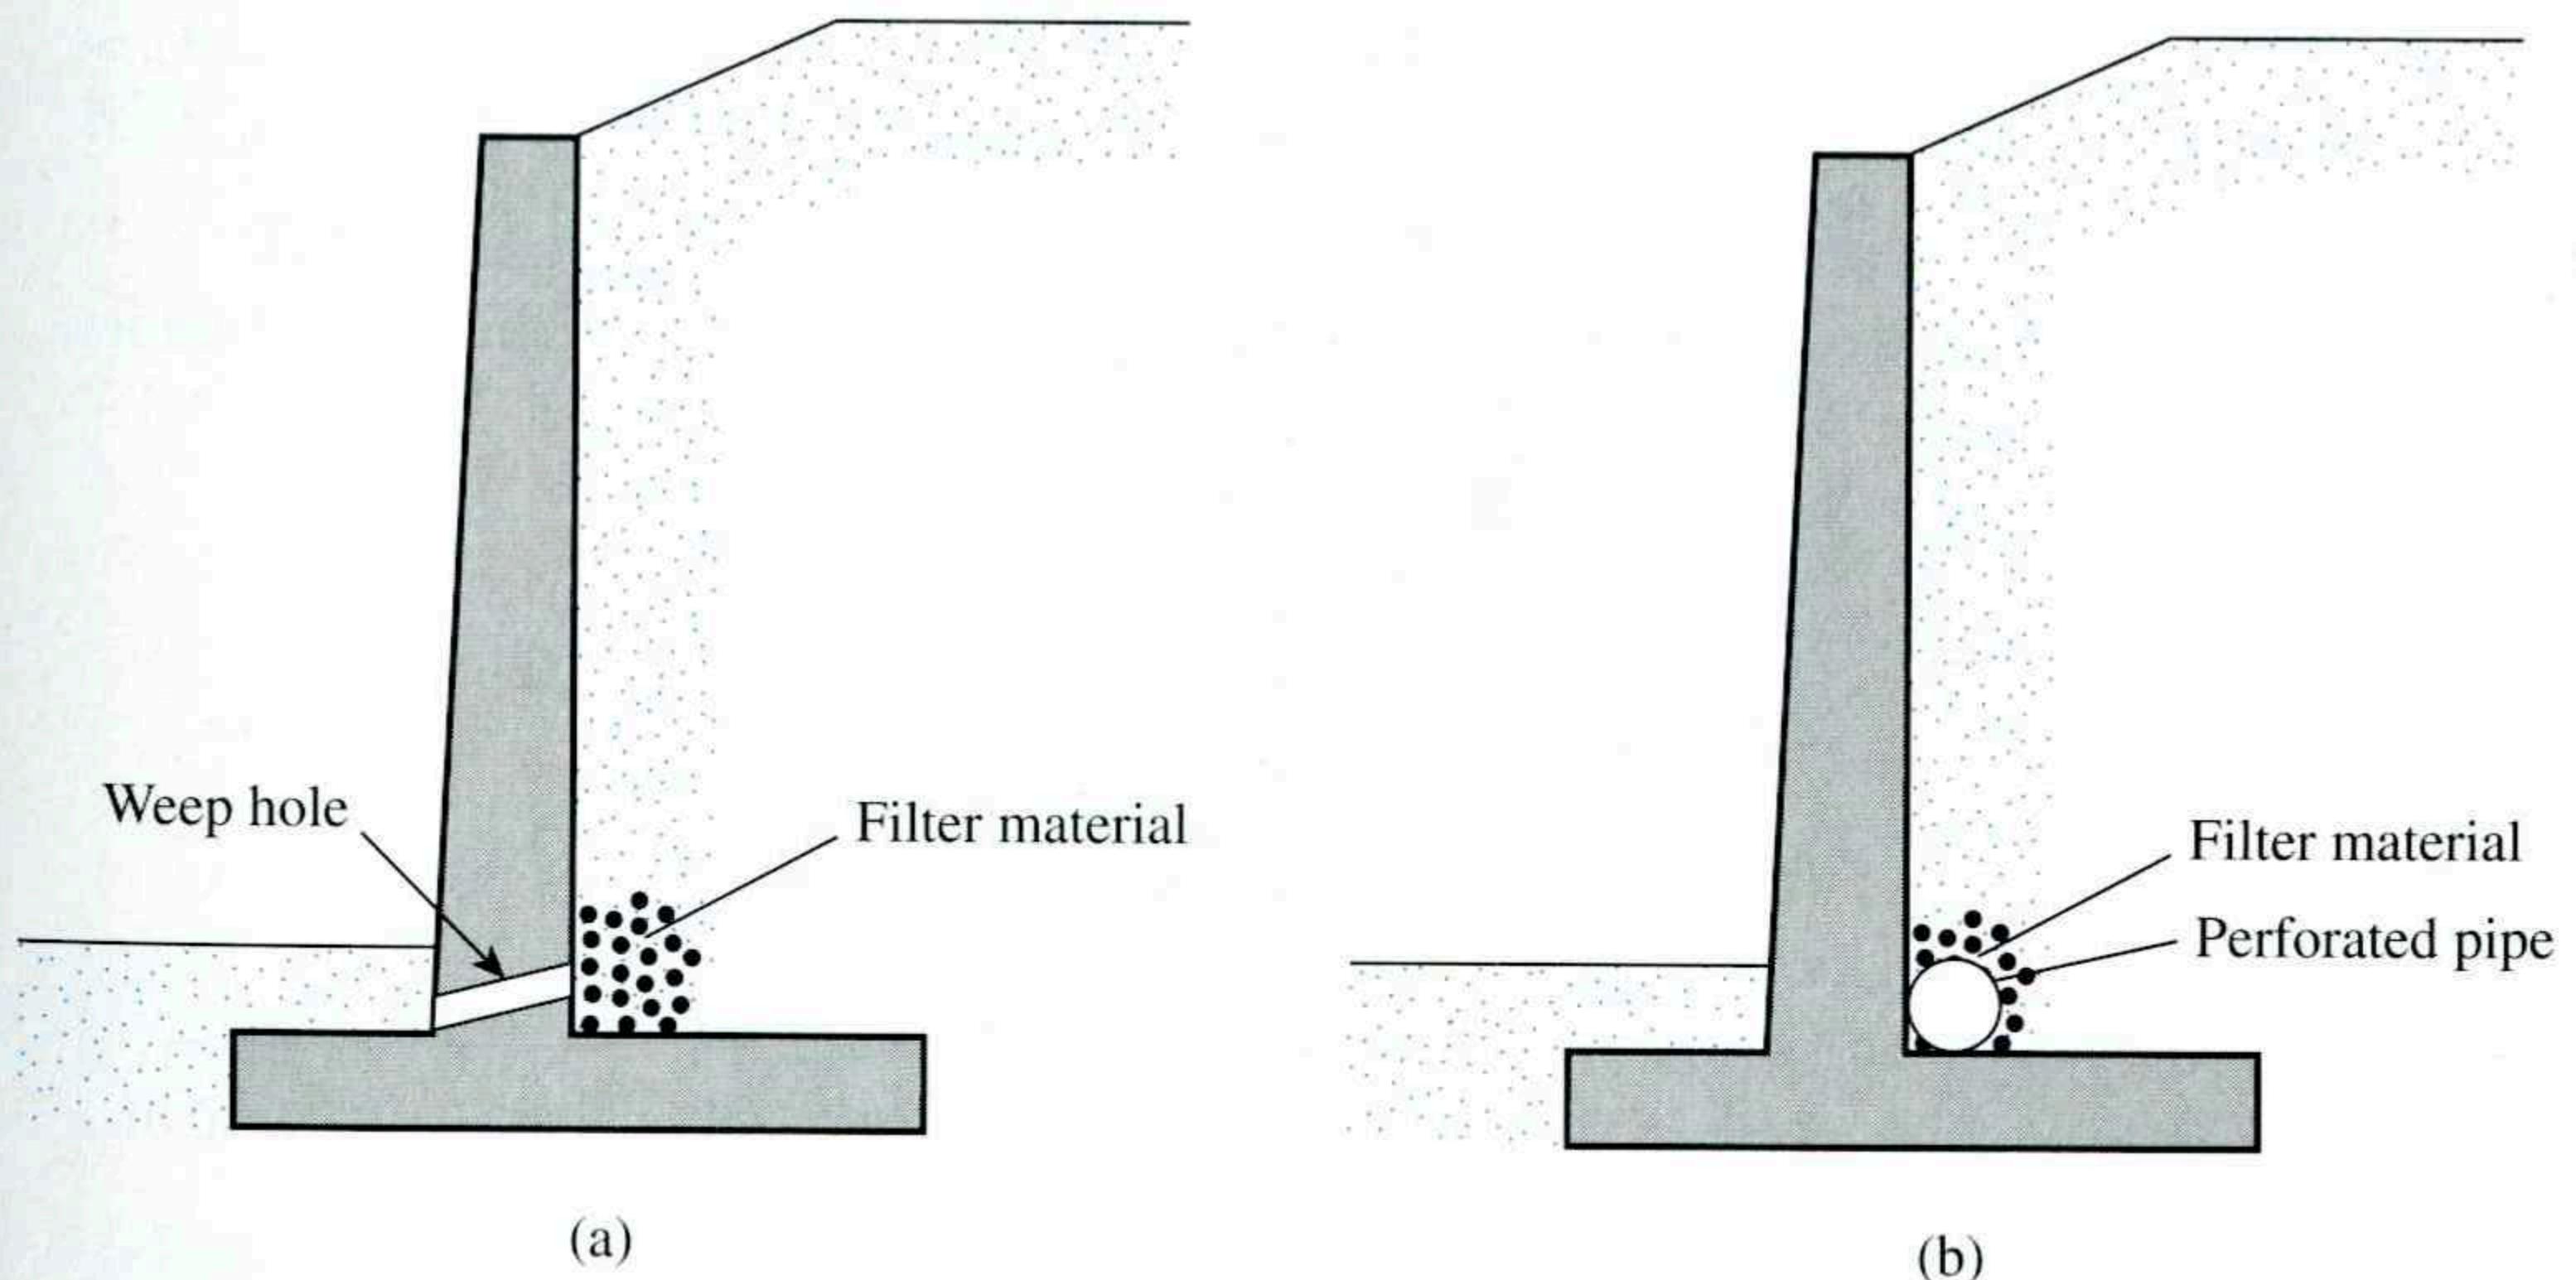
Drainage provisions for the backfill of a retaining wall: (a) by weep holes; (b) by a perforated drainage pipe
